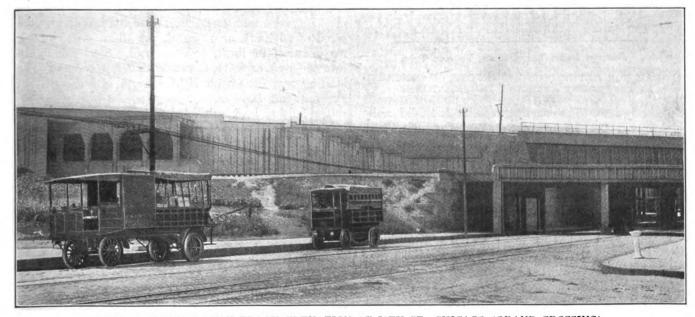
DOUBLE-DECK TRACK ELEVATION AT 78TH ST., CHICAGO (GRAND CROSSING)
